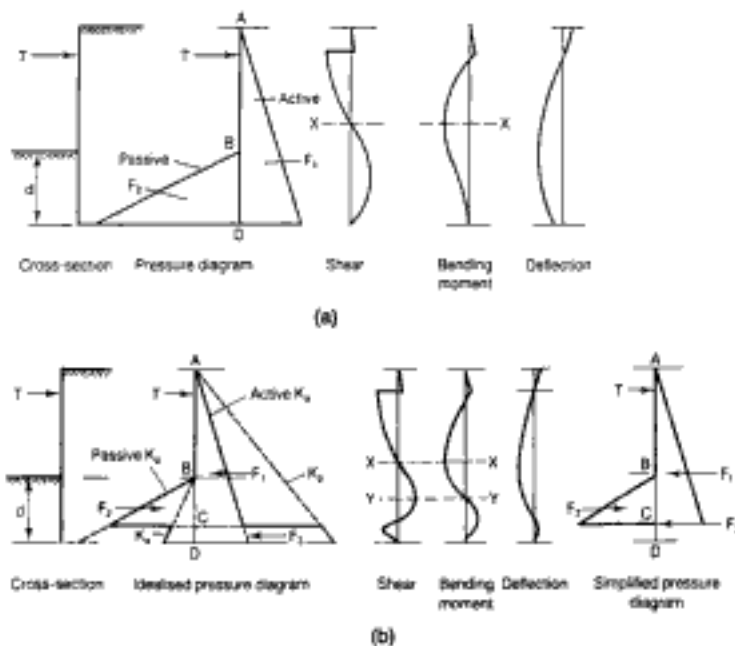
Single propped or anchored wall with: (a) free earth support; (b) fixed earth support (CIRIA¹)
